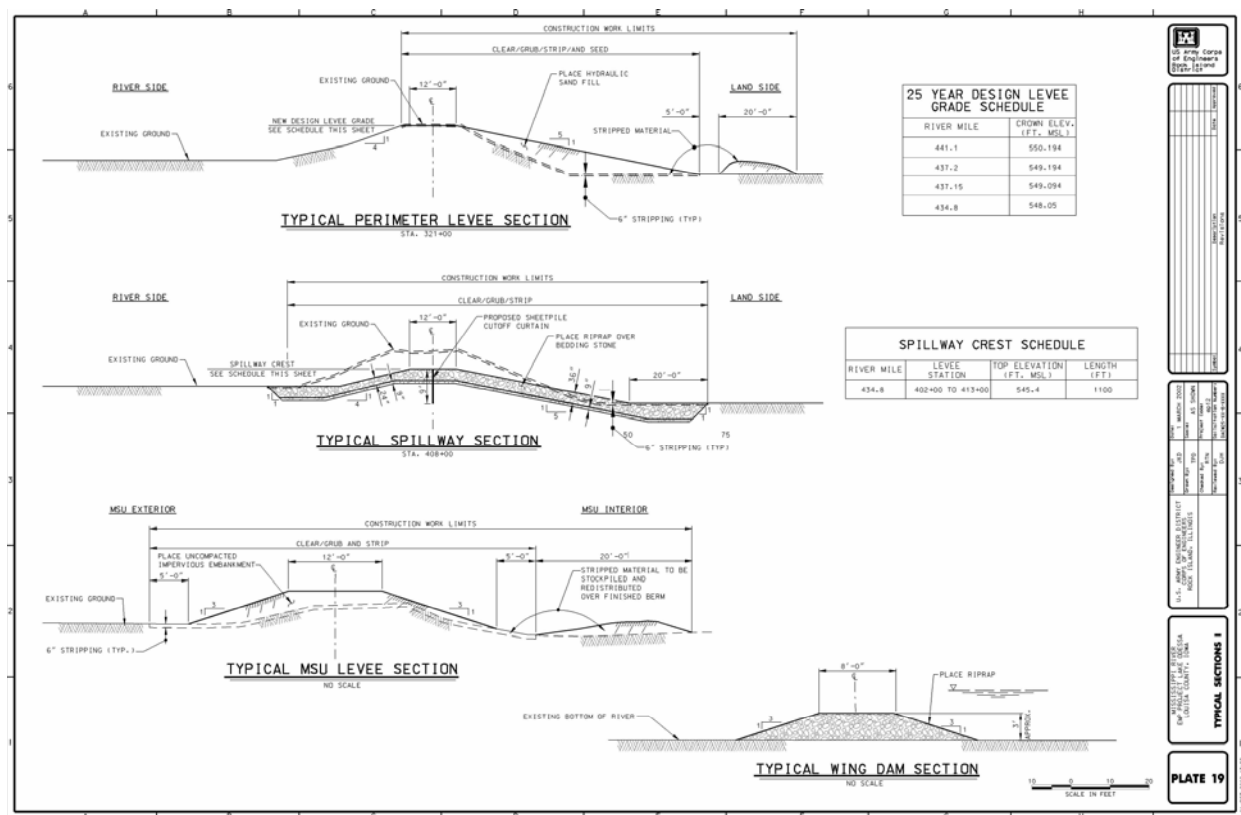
Typical Sections, Perimeter Levee Enhancement.
